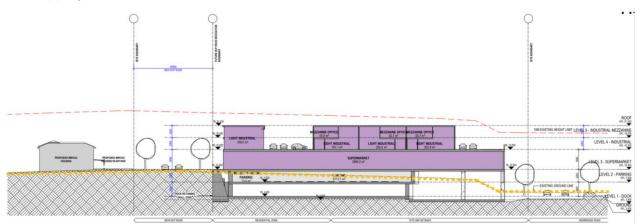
Proposed section showing existing ground level in yellow (Tooker and Associates 2023).
